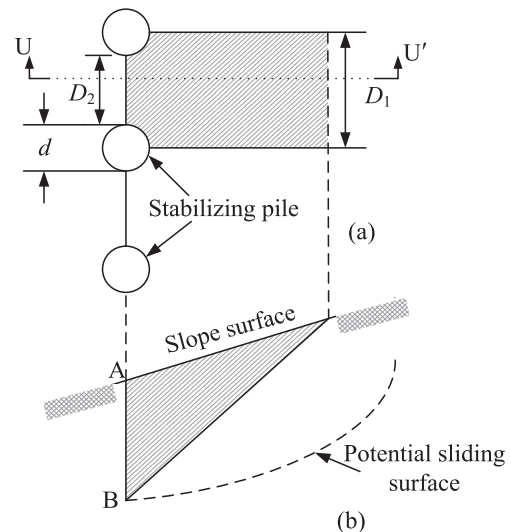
Soil arching adjacent to the stabilizing piles in a slope: (a) plan view of the soil arching zone; (b) cross section of the soil arching zone in the slope.
